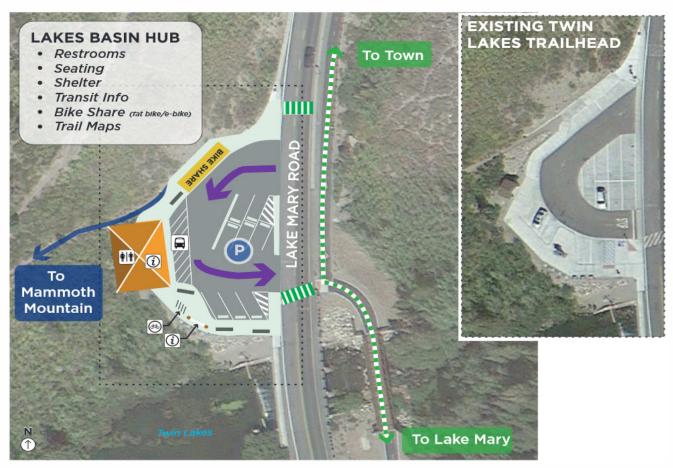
Example Mobility Hub Conceptual Site Plan from the Walk, Bike, Ride Action Plan
